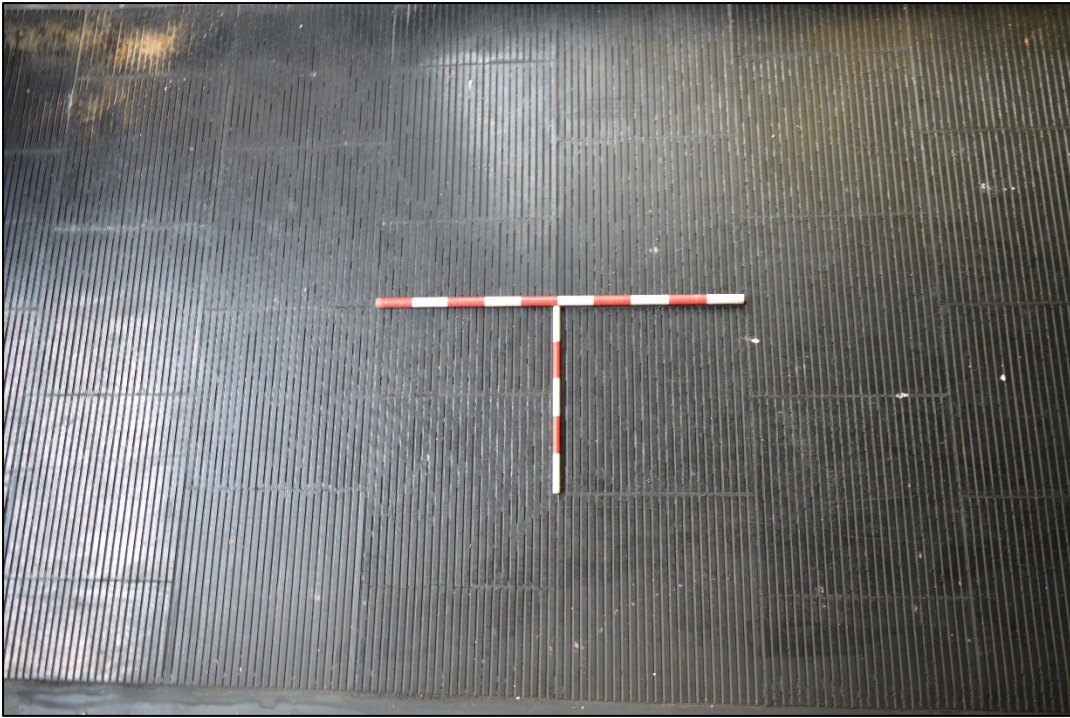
Detail of entrance ramp black rubberised tiles, looking south
